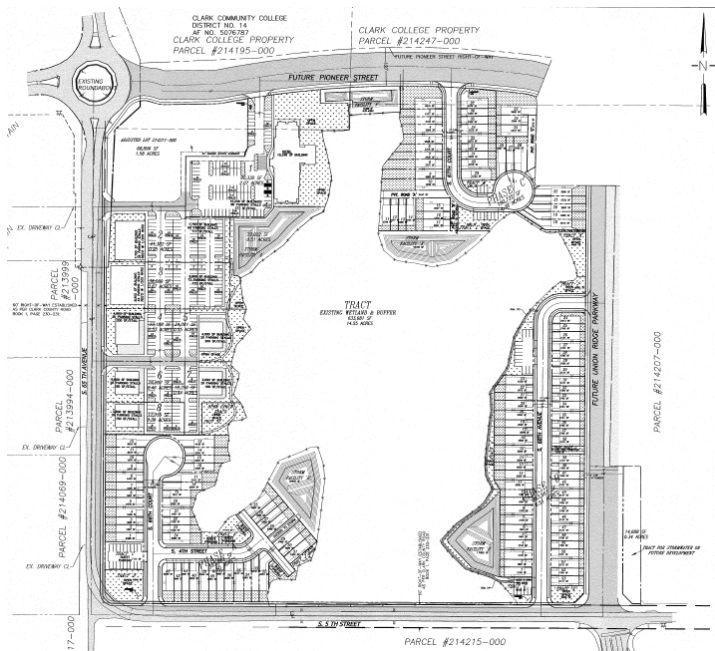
Ridgefield Crossing Mixed Use Master Plan
